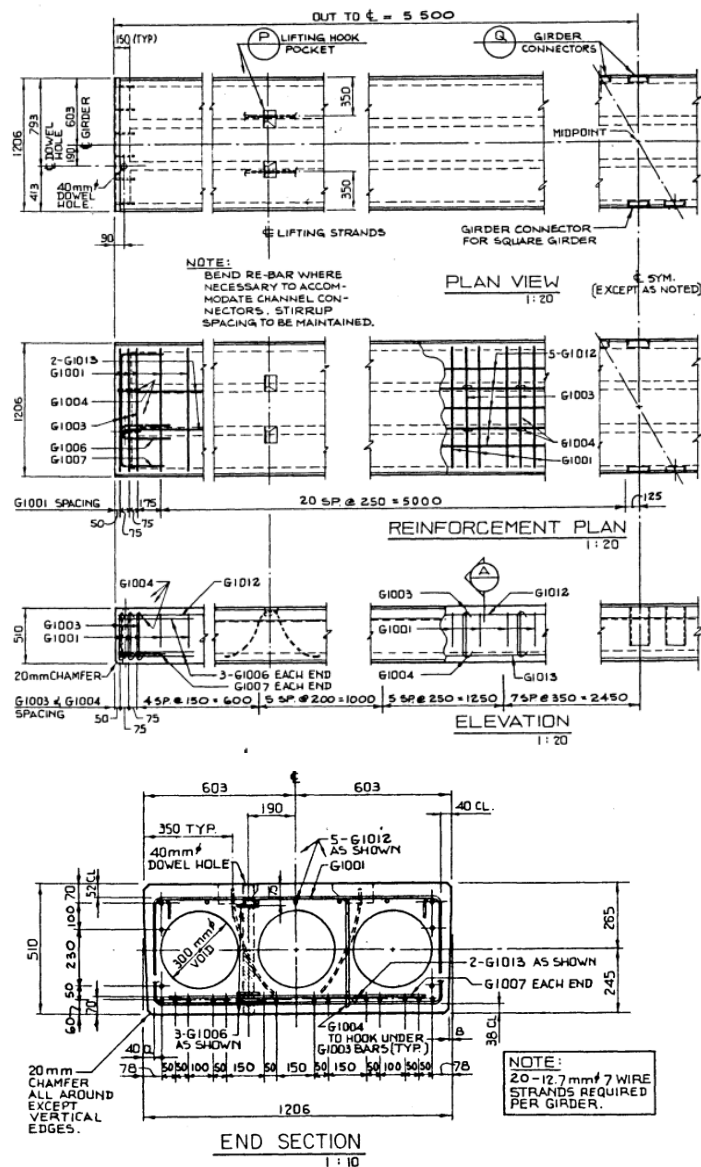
The Design Plan of the Box Girder (Alberta Transportation 2018)
